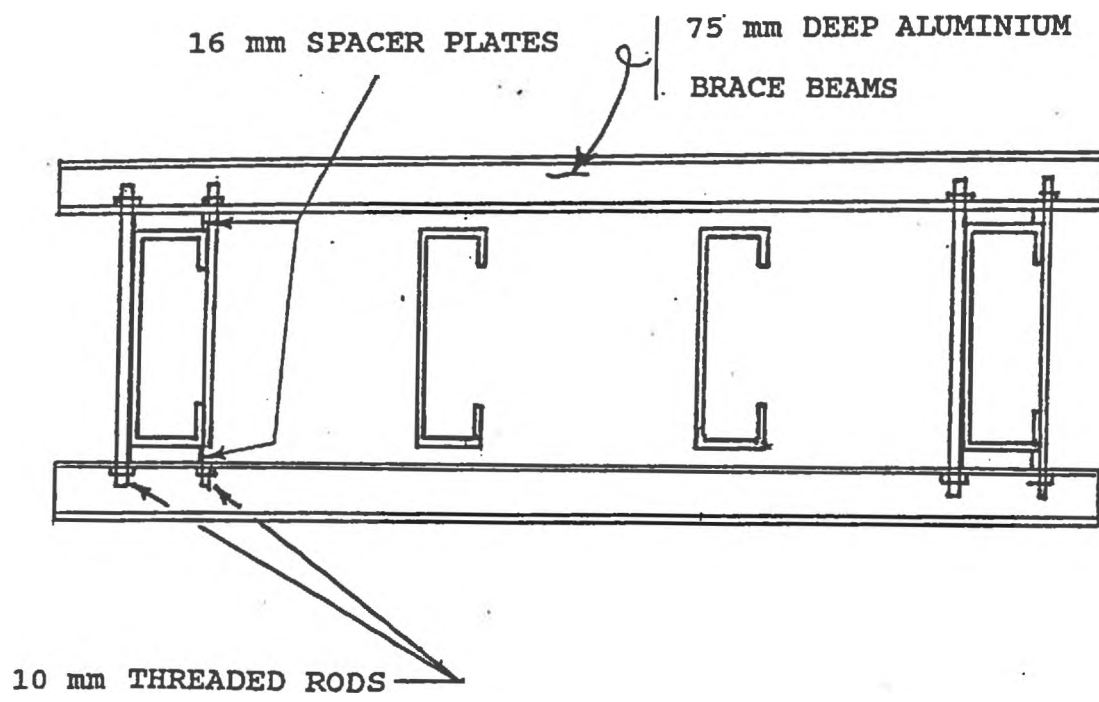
Cross-Section of 4 Stud Specimen Showing Exterior Wall Stud Bracing
